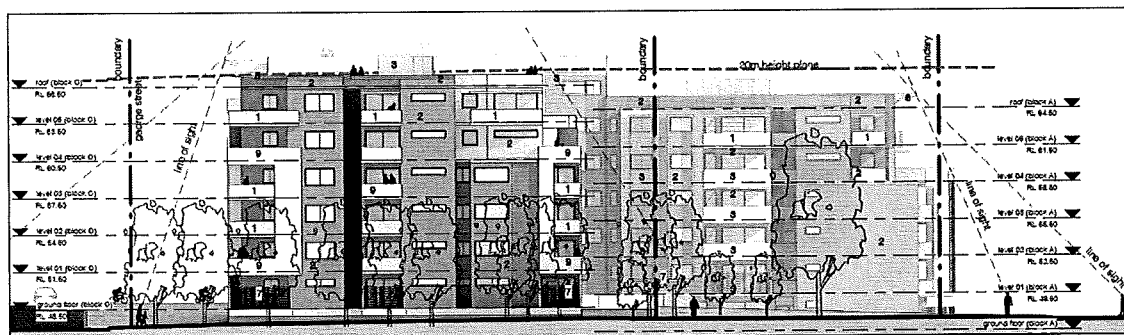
George Street elevation - 20 metre height shown in blue (Source: GM Architects)
